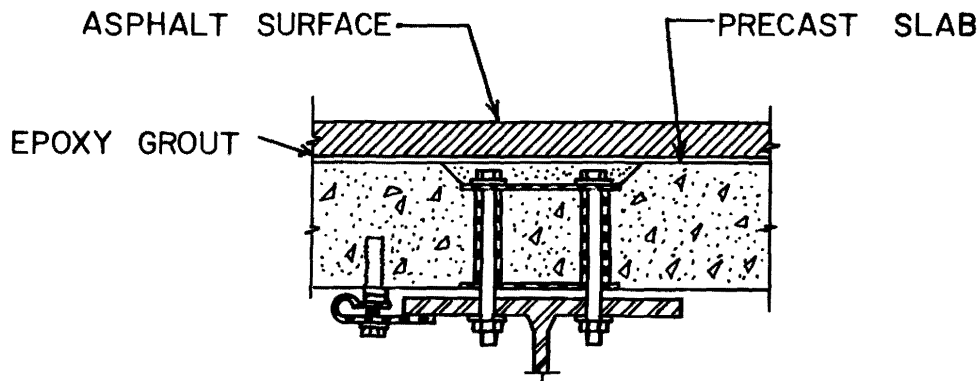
Bolted Connection Details, Amsterdam, New York. New York Thruway Authority (2).
